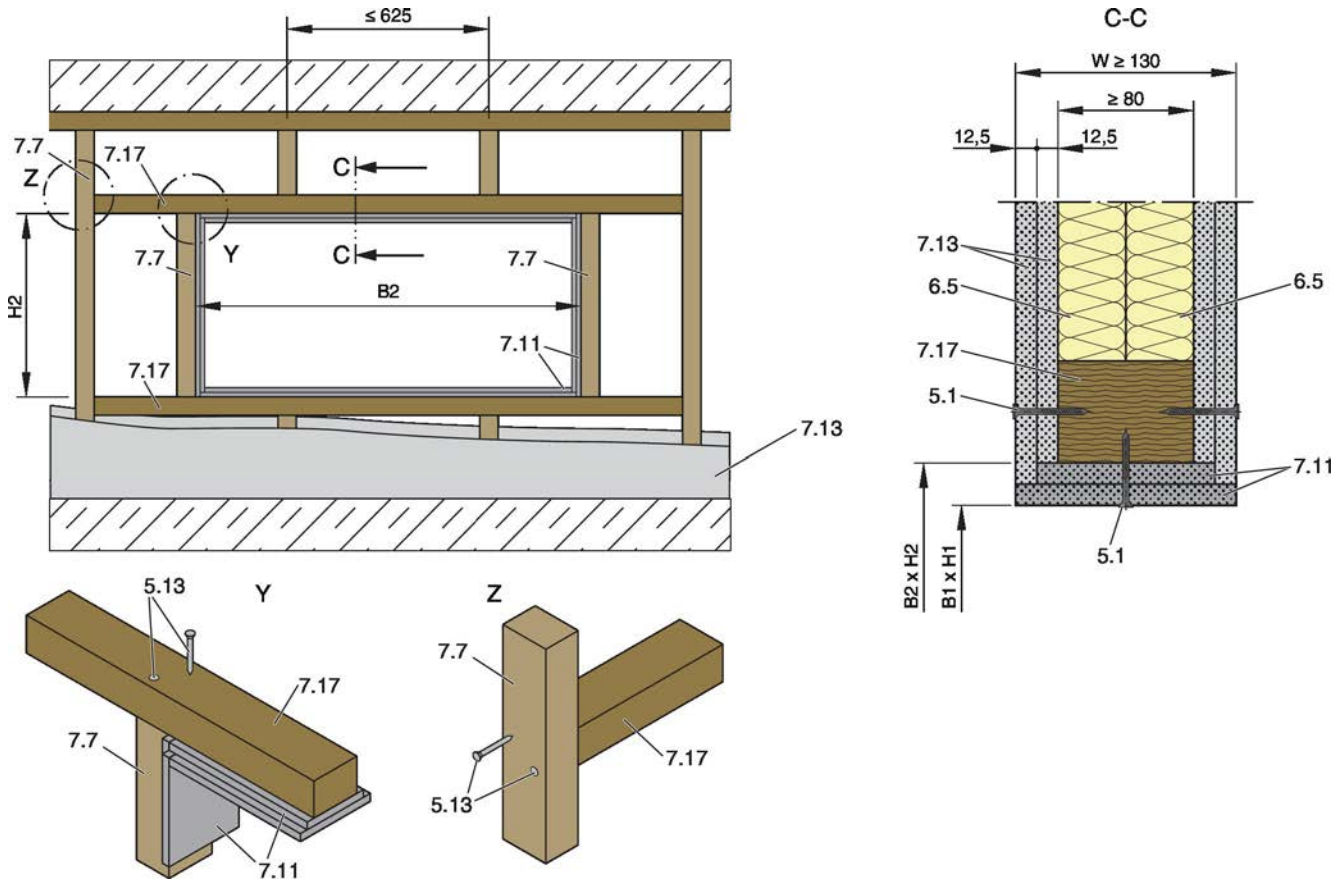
Lightweight partition wall with timber support structure and cladding on one side
